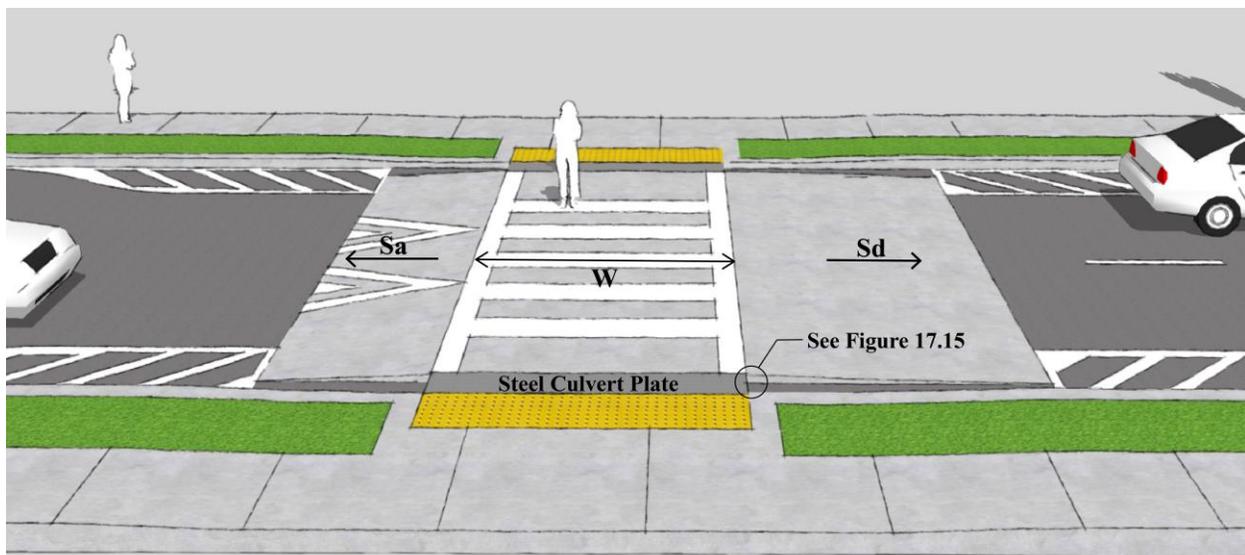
RAISED CROSSWALK ON A ONE-WAY ROADWAY WITH THE APPROACH SLOPE (S_a), DEPARTURE SLOPE (S_d) AND PLATFORM WIDTH (W)
